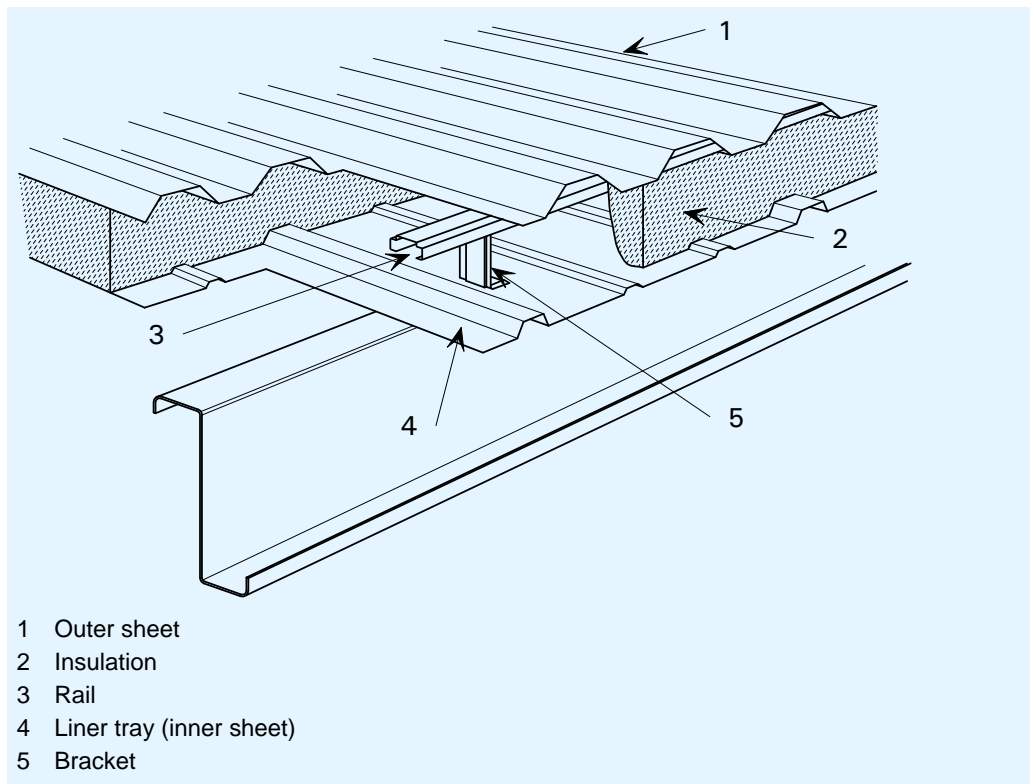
Double-skin construction using 'rail and bracket' spacers
